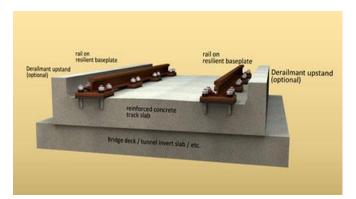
Ballastless track (rail and fattener embedded in base slab)
